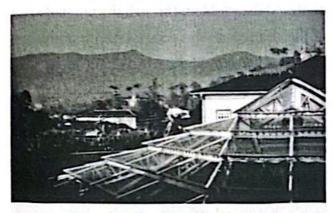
The glass roof of the new archbishop's house (Grid E6)
